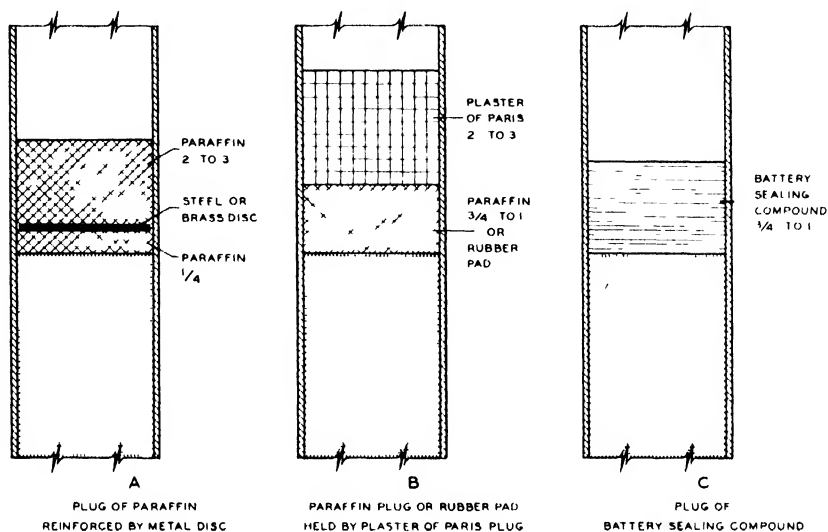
SEALING PLUG IN SAMPLING TUBE
